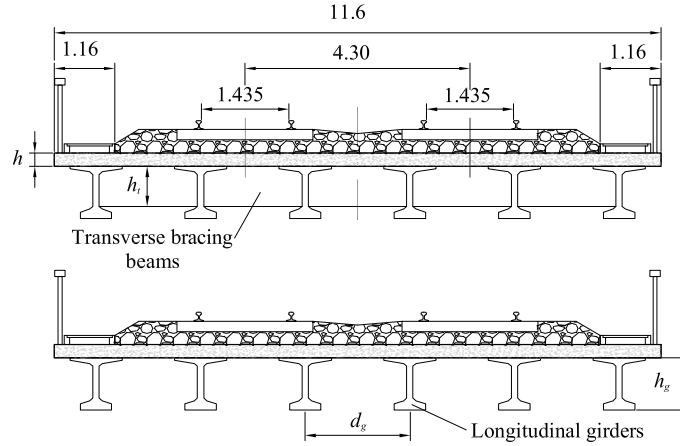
Cross section of the girder bridges of study. Top: cross section at the abutment; bottom: intermediate cross section.
